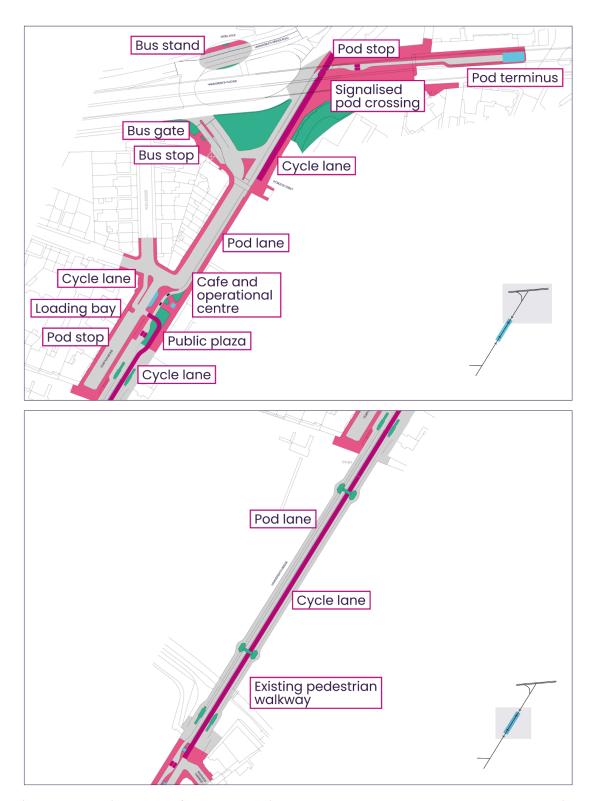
A: Site plans for remodelling the road layout around Hammersmith Bridge.
